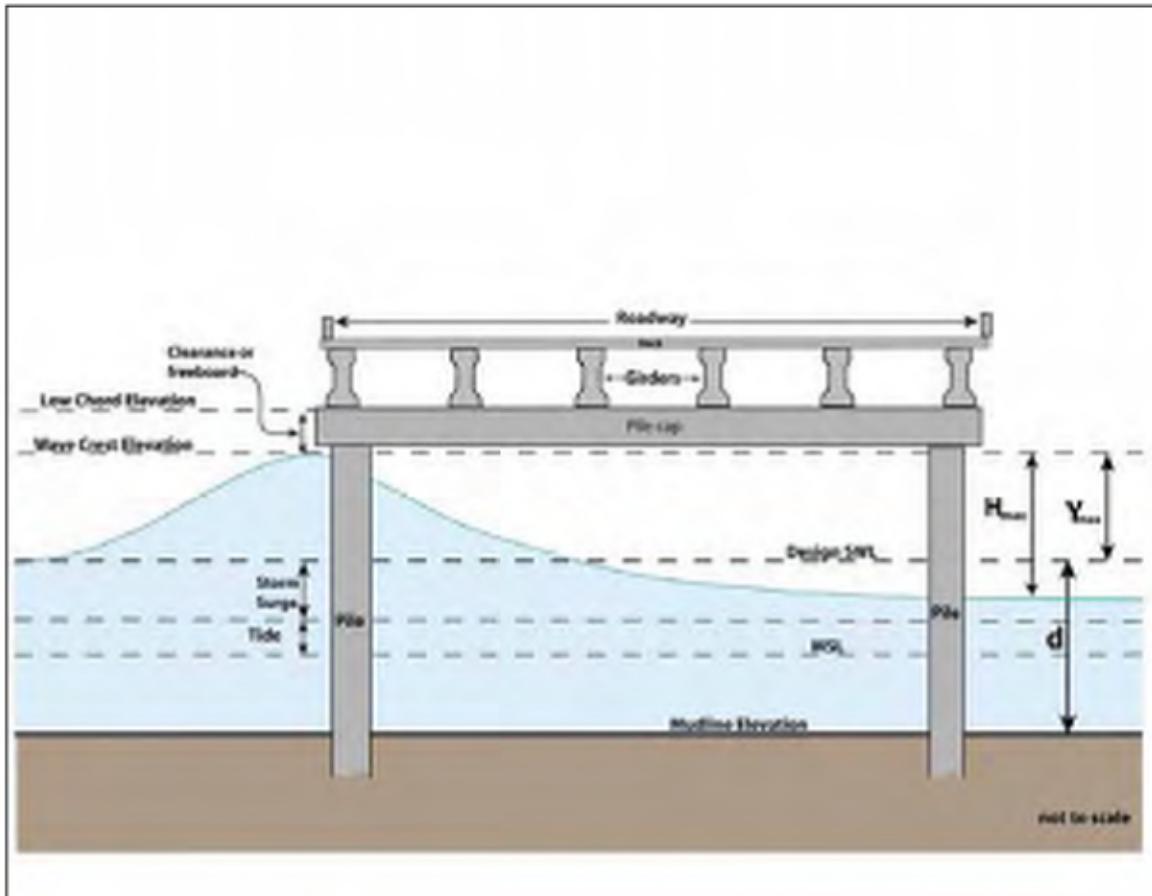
Definition sketch of wave parameters and water levels for determining elevation of bridge deck for clearance from wave crests
